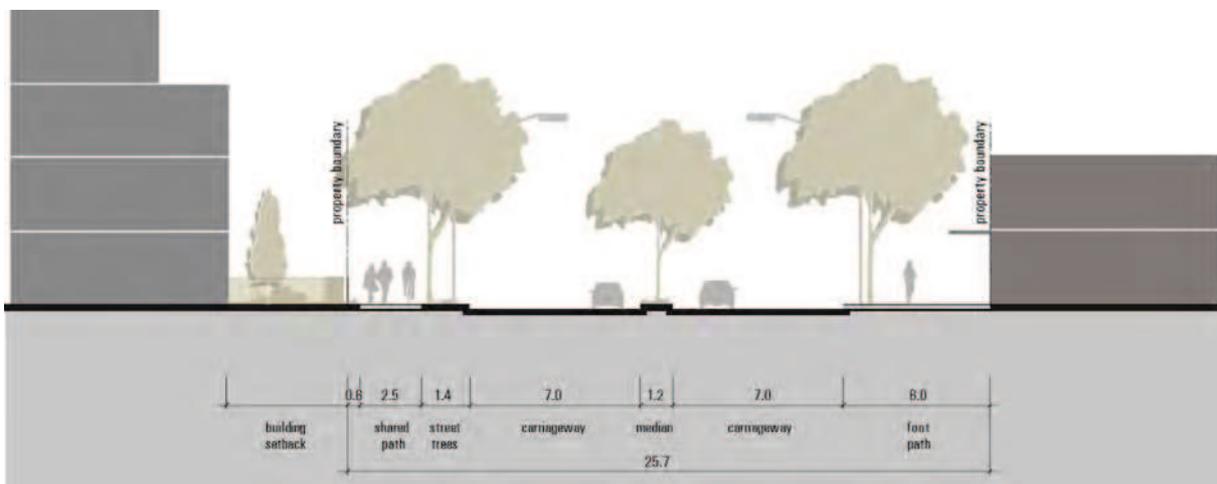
Sub-arterial Road (Terry Road between Killarney Chain of Ponds and Mason Road)
